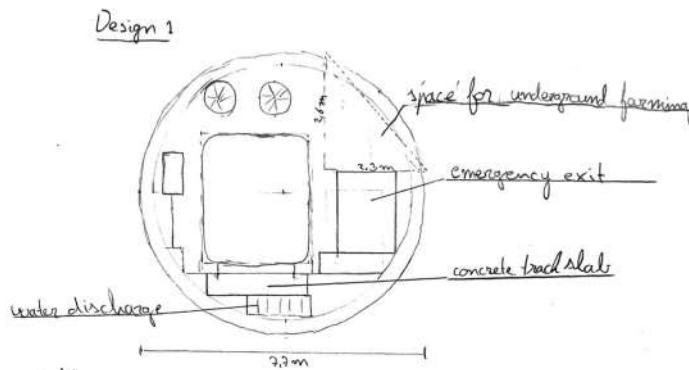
Cross section of the metro tunnel (Hydraulic discipline)
